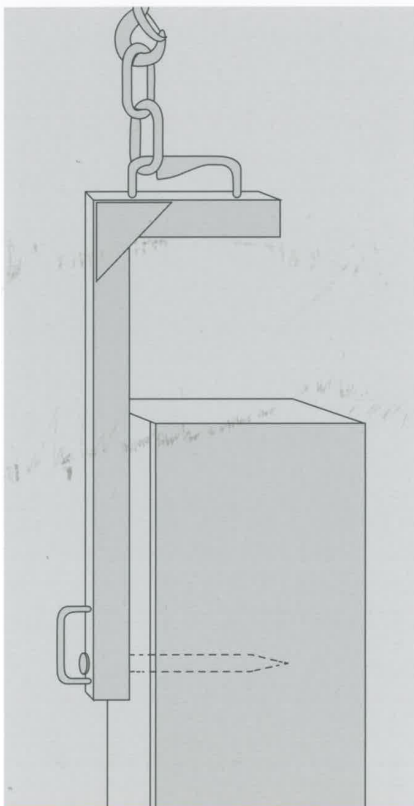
Lifting hook (Hebel® vertical wall panels).
